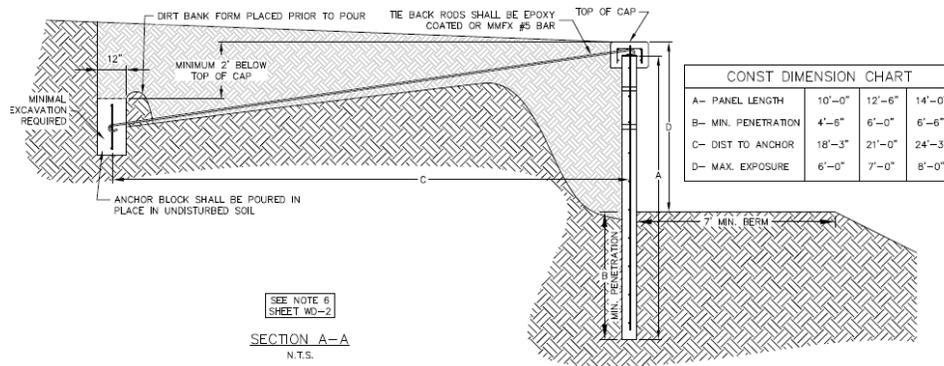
Typical Sheet Pile Tie-back Seawall Cross-section
